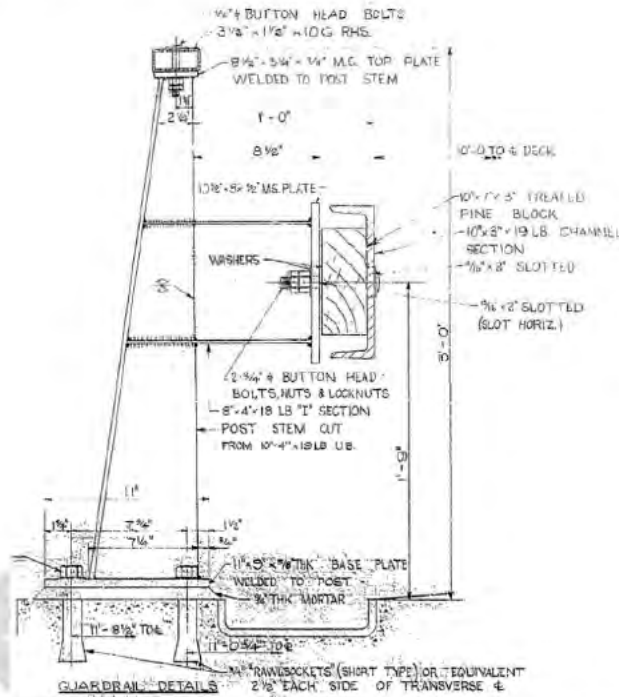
Post Detail from Construction Drawings (Designed in 1968)
